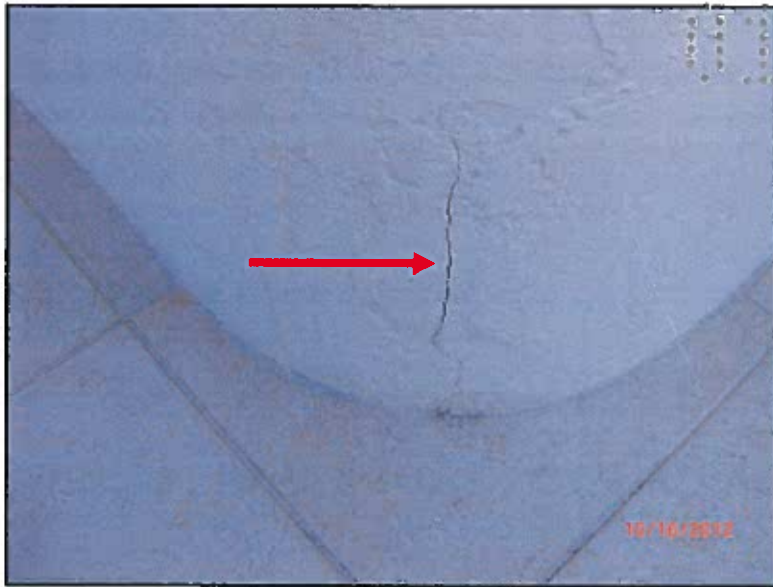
Vertical cracking on building wall located at balcony Unit #219
